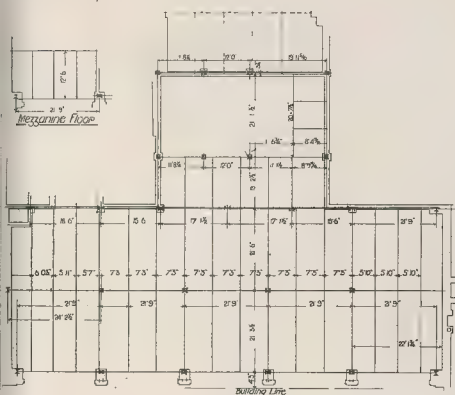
Basement Plan showing Steelwork in Ground Floor.
